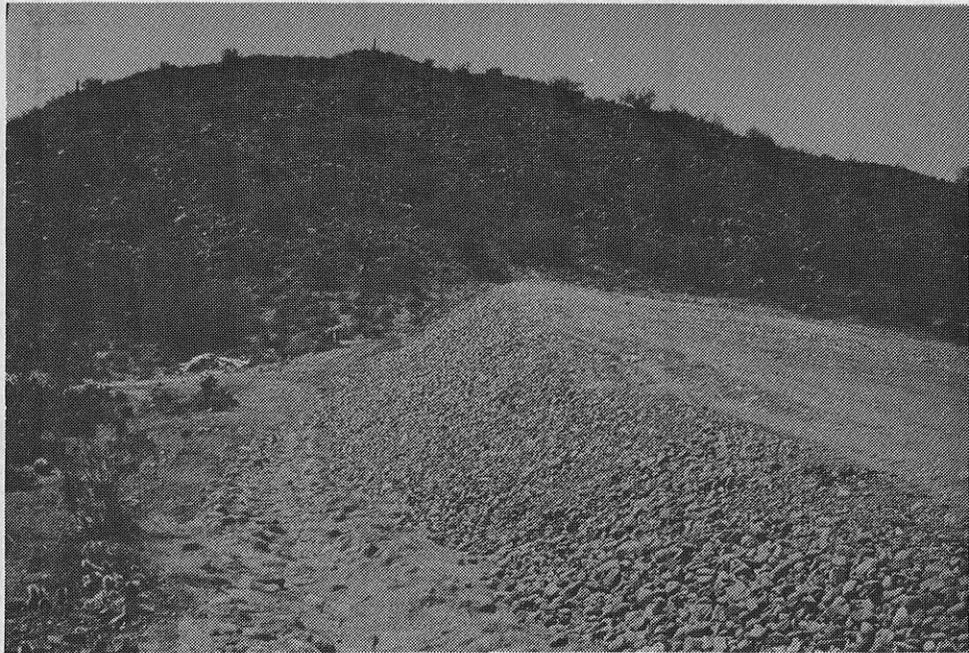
Downstream face of dike no. 2 embankment. March 1985
